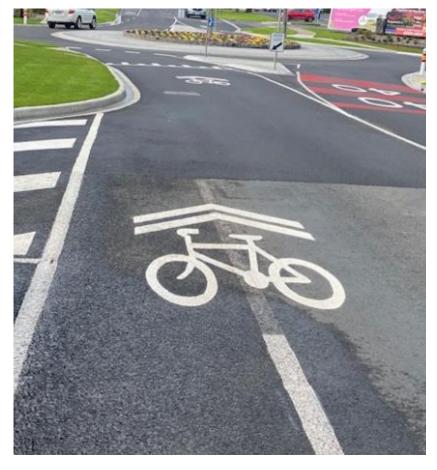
Sharrows – intersection of Banyan Street and Merri Street
